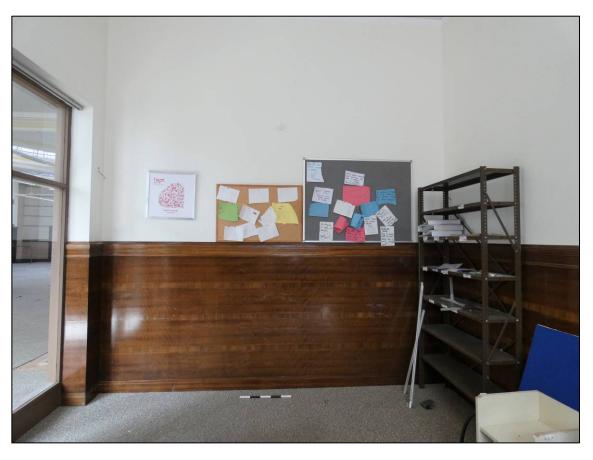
Assistant manager's office (GF13), wood panelling, looking N (photo 965).
